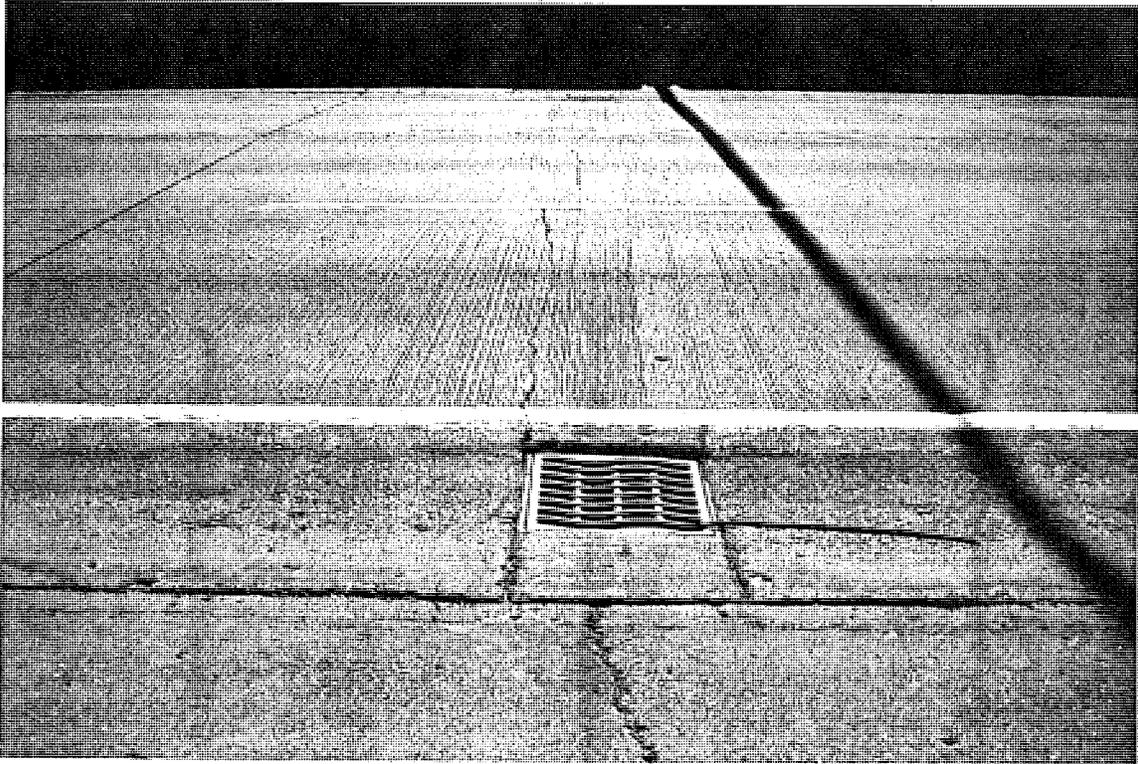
A drainage structure that has induced a full width transverse crack on CSN# 25132-06582A SB.
